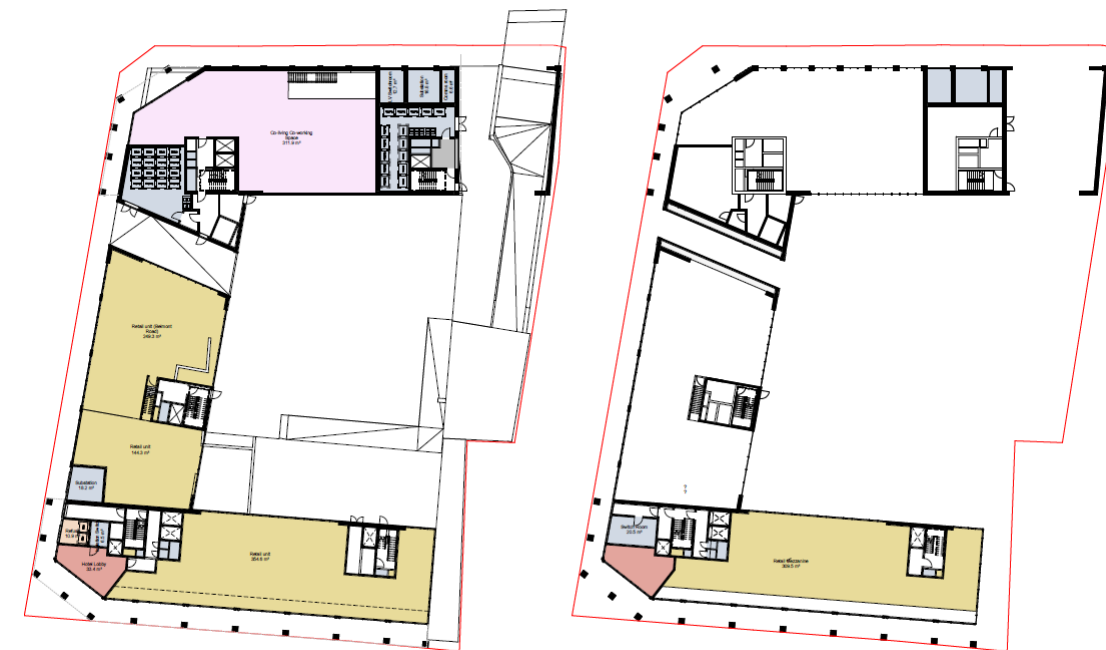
Lower floor plans of floor plates to be assessed (Retail).
